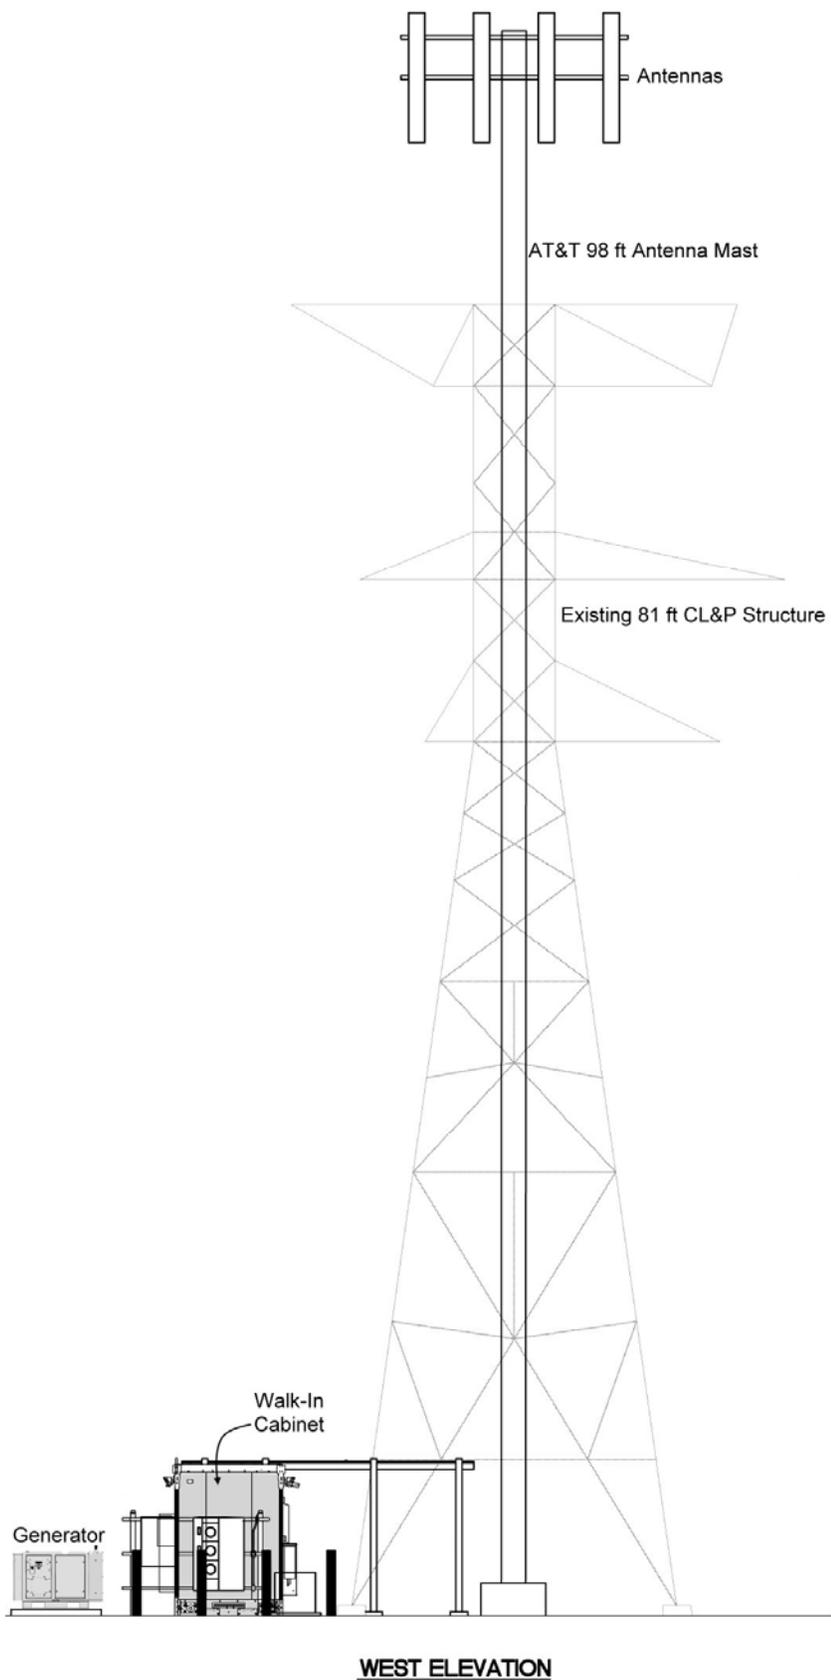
Plan Showing the Proposed Elevation Layout of the Site
